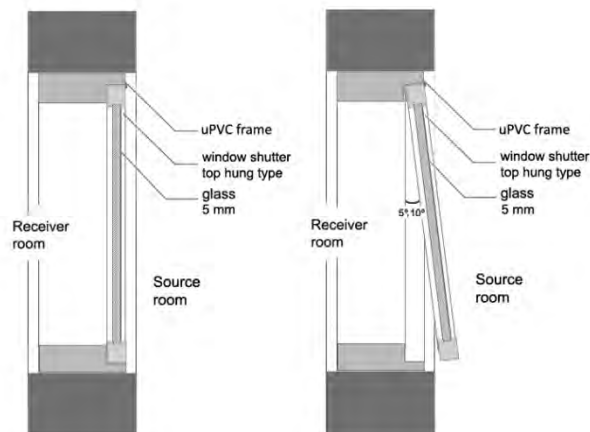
Section showing the degree of openings of the window shutter; 0° (a) and 5° and 10° (b).
